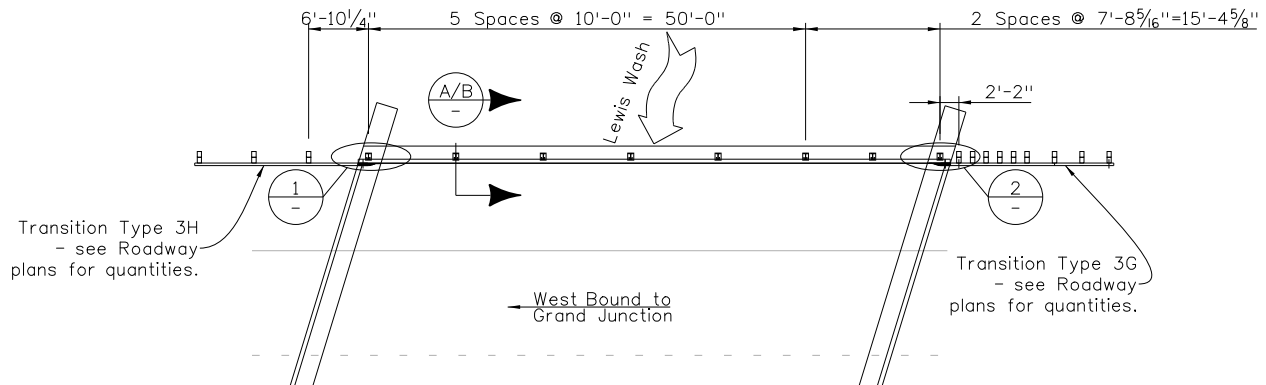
(A)-1 Sample Plan showing Bridgerail Post Spacing
